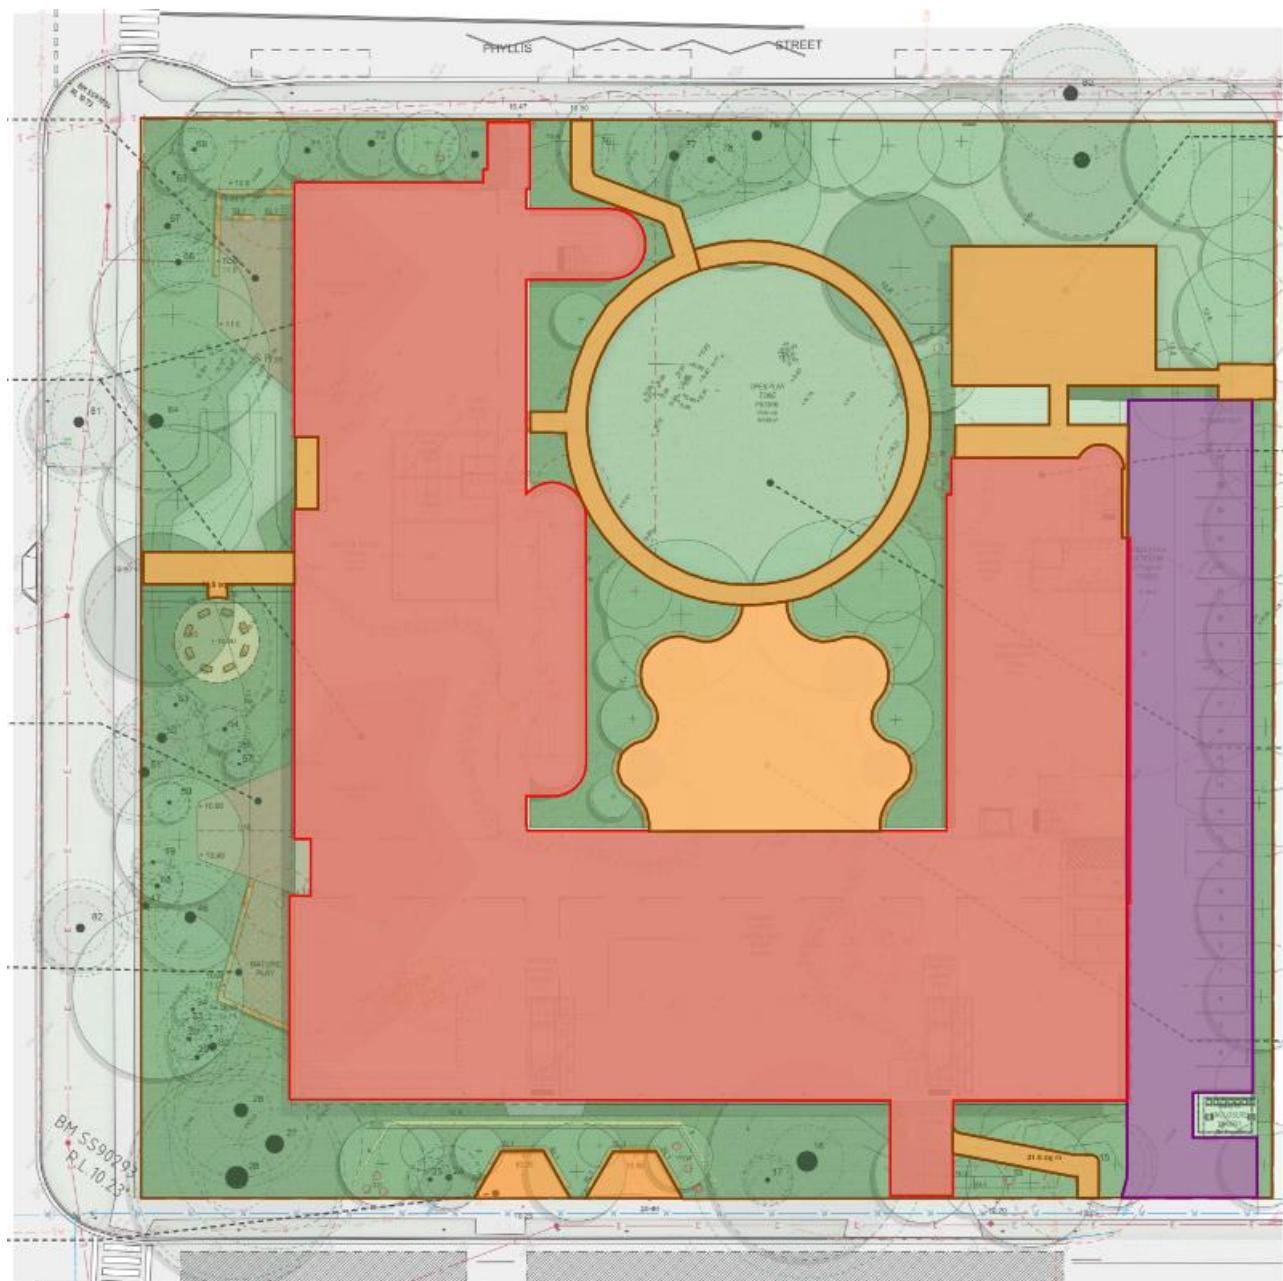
Post-development Site Catchment Plan (purple = roof, red = hardstand, green = soft landscape)
